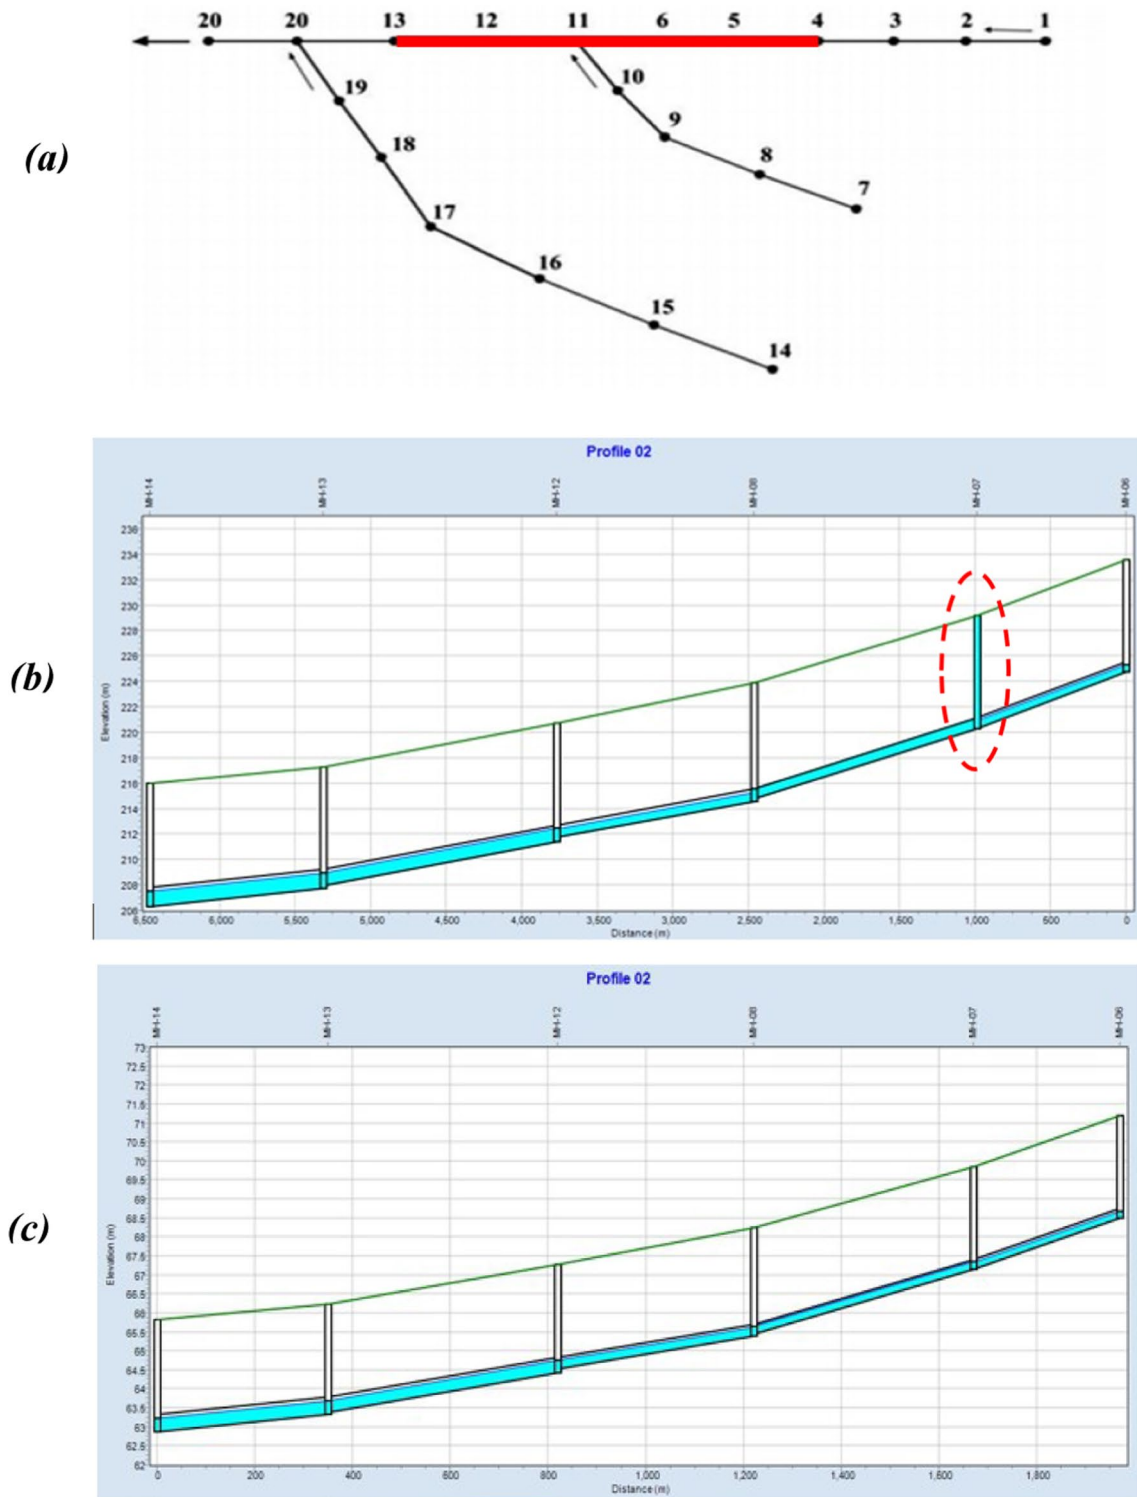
Longitudinal profile for the first benchmark example (a) key plan, (b) GA-HP method, and (c) HBOA method
